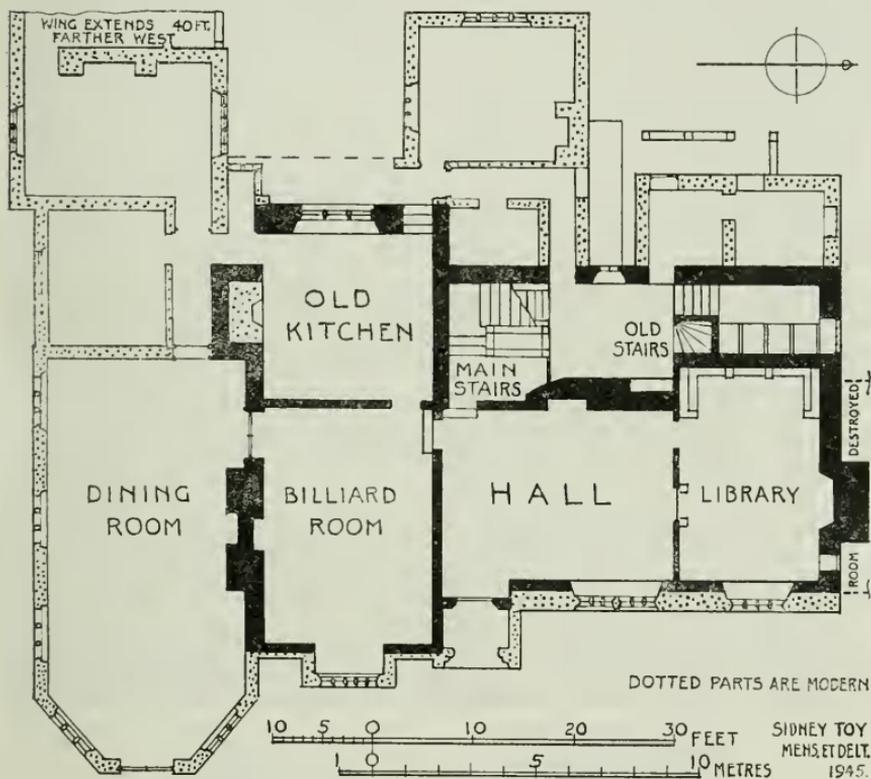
BRABŒUF MANOR: PLAN, GROUND FLOOR.
